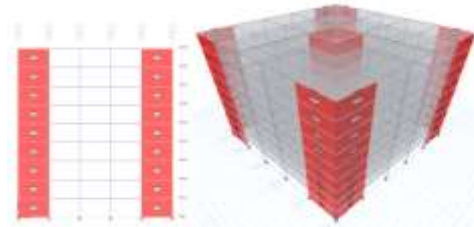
Edge Shear wall + Corner shear wall + Core model
